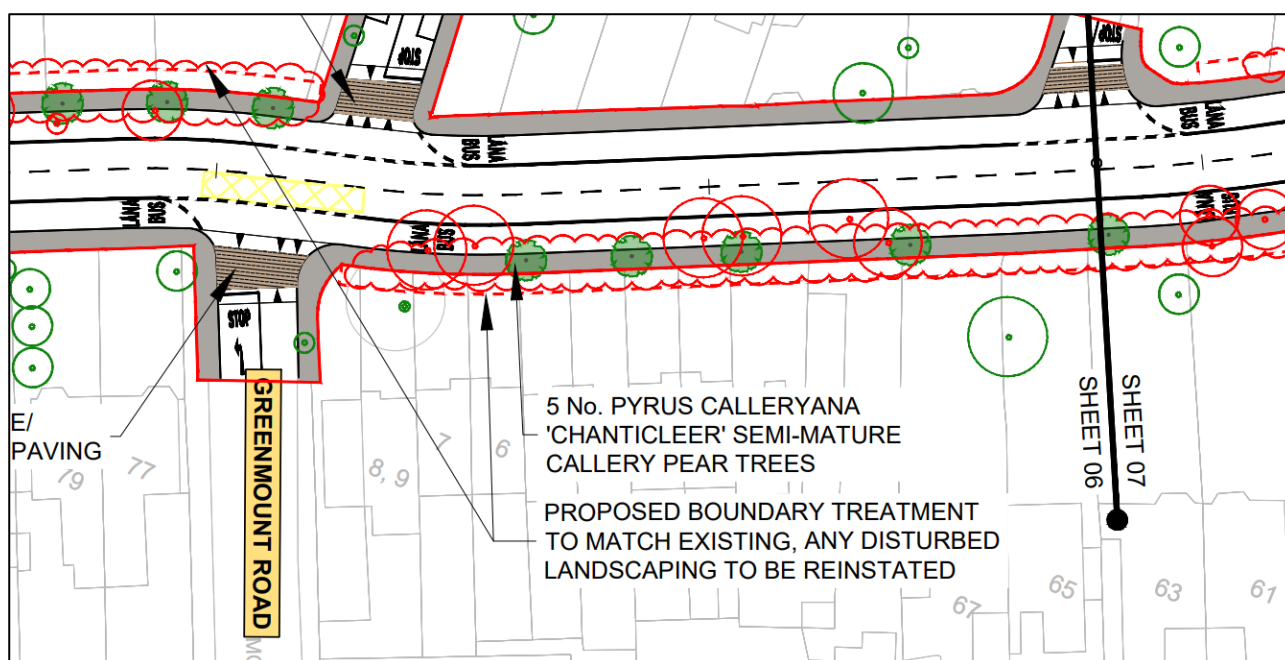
Landscape General Arrangement Drawings at Terenure Road East
